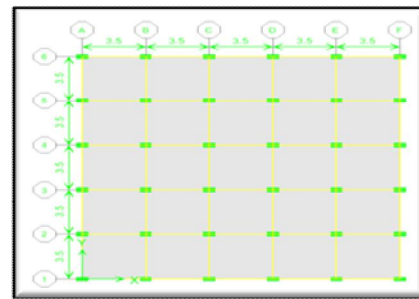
Plan of (G+7) Storey RCC Building (Space Frame)
